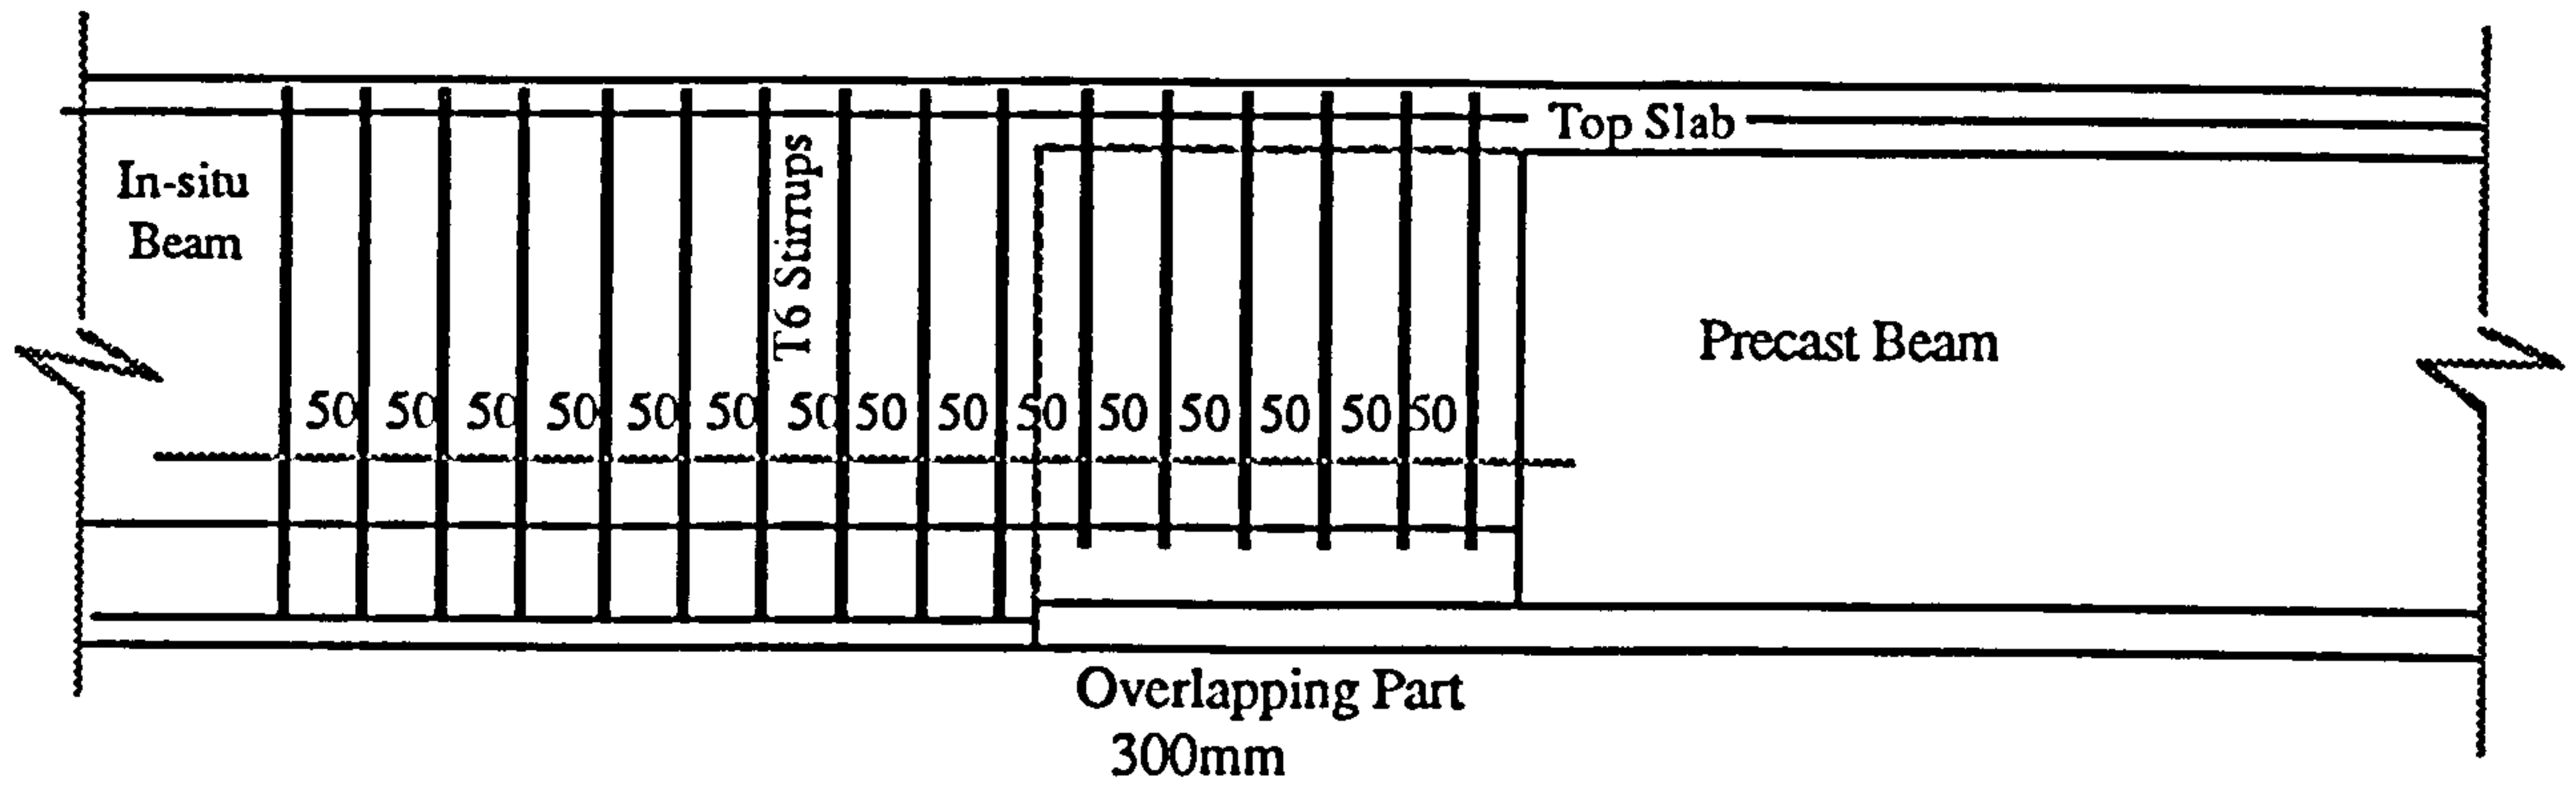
Stirrup Spacings in the In-situ Nibs and In-situ beam Tests E30AA1 and E30AA2
